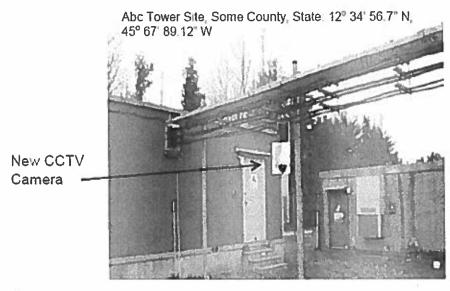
Ground-level photograph with graphic showing proposed equipment installation.
